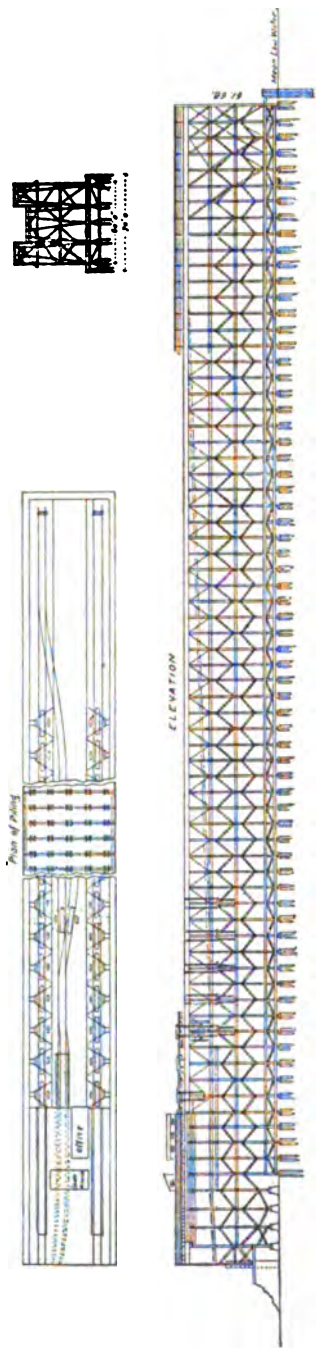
Plan and elevation of coal pier at Curtis Bay, Md.—Baltimore & Ohio.
